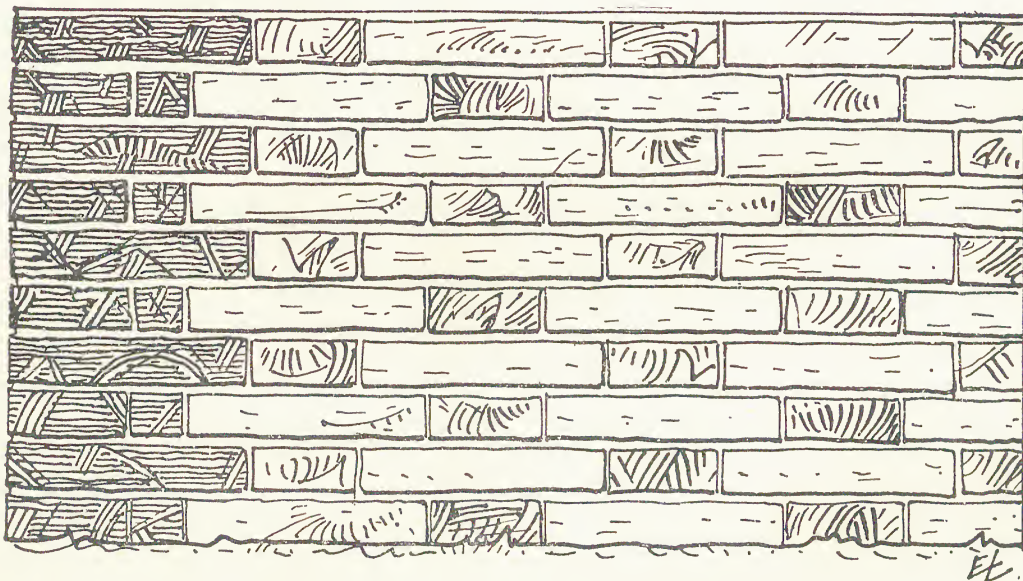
Corner bricks of dark colour; walling headers of medium colour; stretchers light colour. This relieves the plain character of large wall areas.
